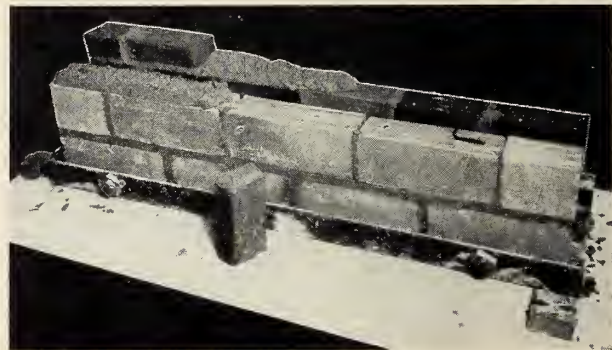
A brick-tile cavity wall under construction for use in structural tests.
